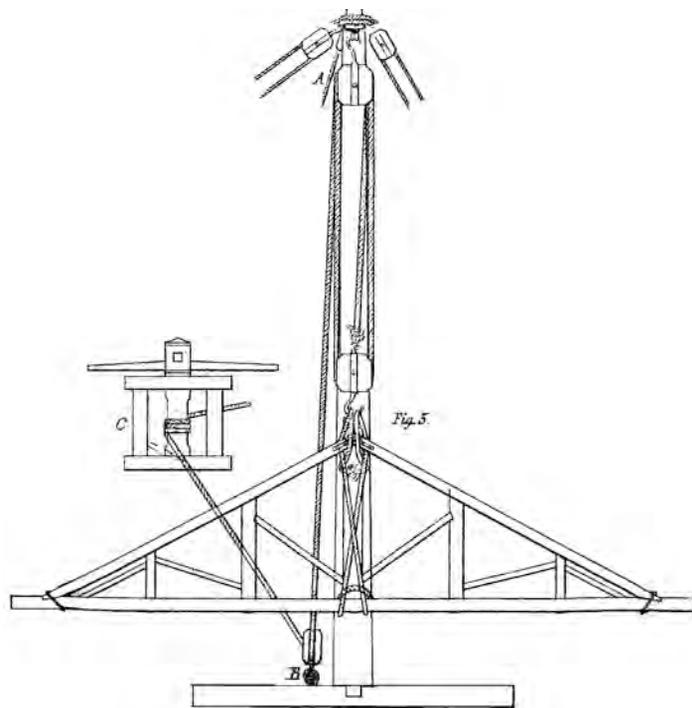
Chester Hills' Fig. 5, an 1836 truss-lifting rig, showing footed gin pole with tensionable guys (A), anchored load pulley (B), windlass (C) and well-lashed demonstration truss. No tag line.
